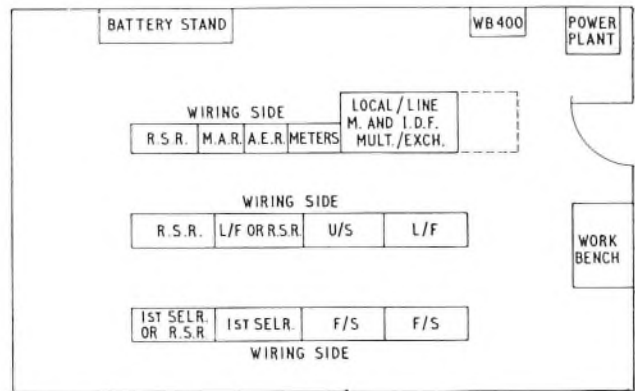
TYPICAL LAYOUT FOR 600-LINE S.A.X. IN AN EXTENDED B1 TIMBER BUILDING
